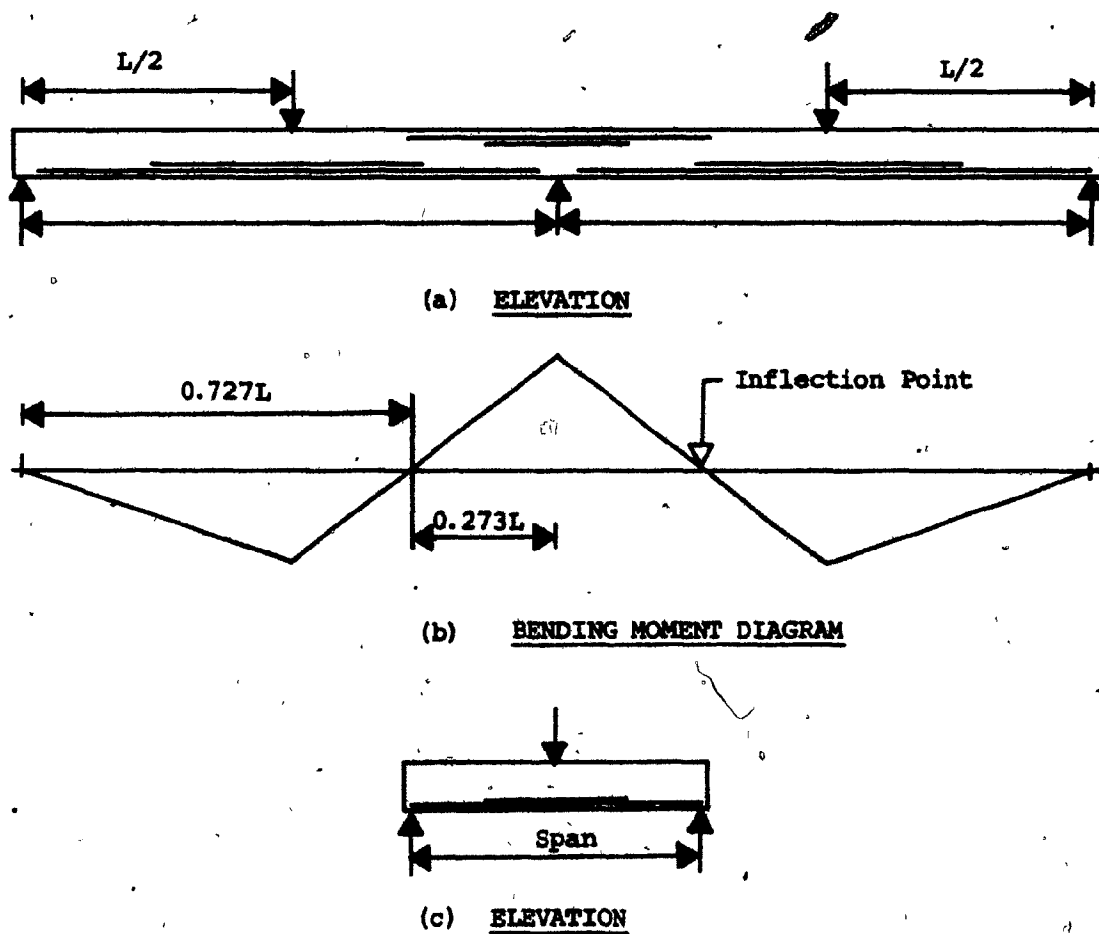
Tentative Continuous Bond Beam and Simply Supported Bond Beam with Central Point Loading
